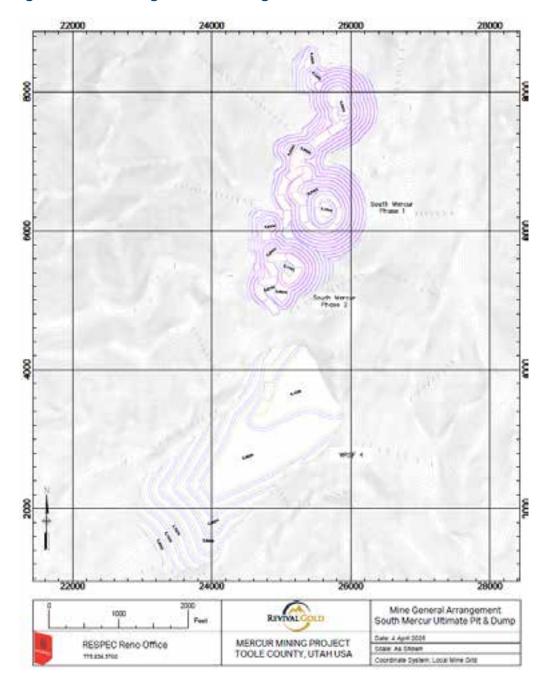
Mining General Arrangement-for South Mercur Pit and WRSF
